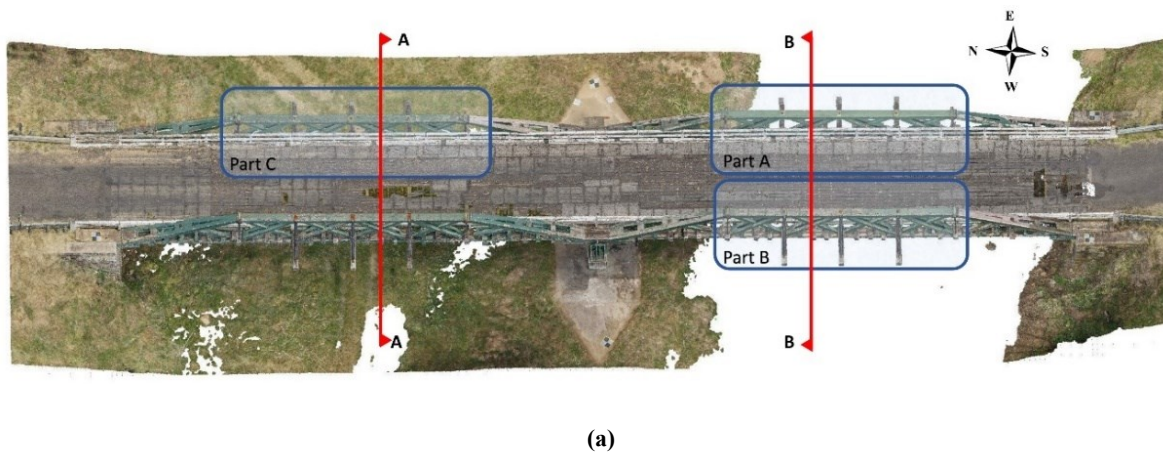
Bridge components and the intended surveying objects; (a) Bridge top view and cross-section.
